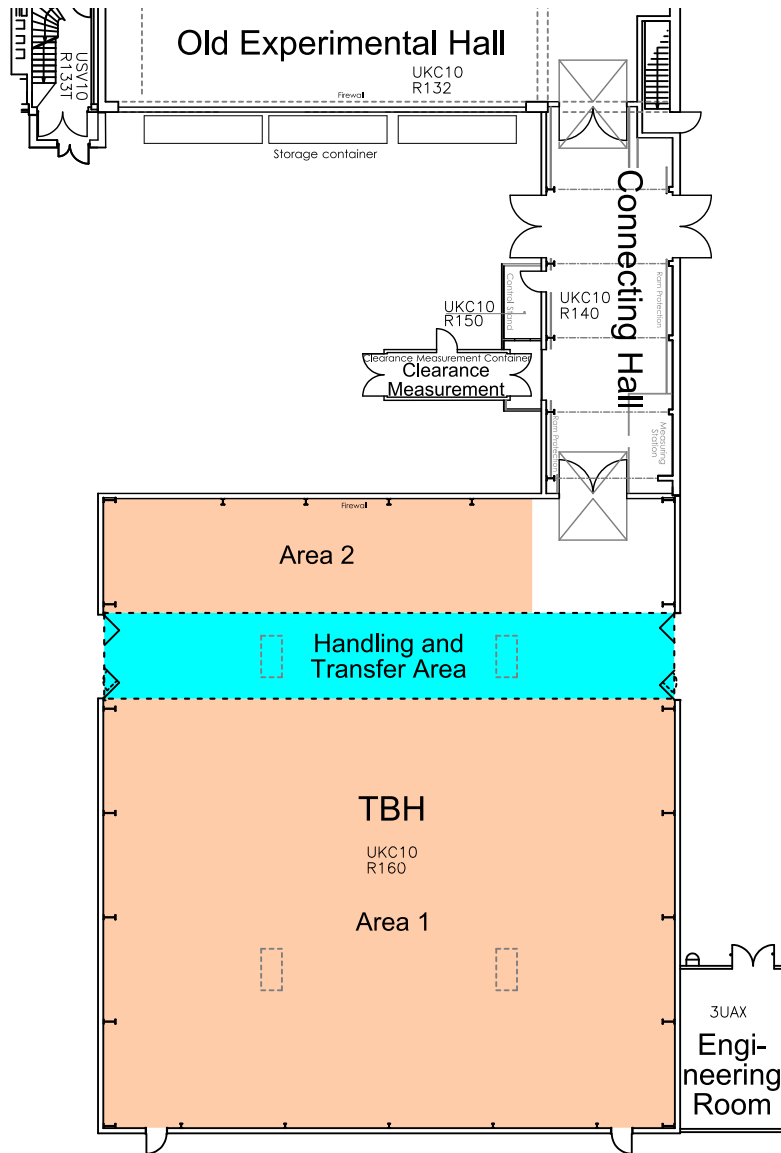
Floor plan of the TBH with adjacent engineering room and Connecting Hall to the Old Experimental Hall
